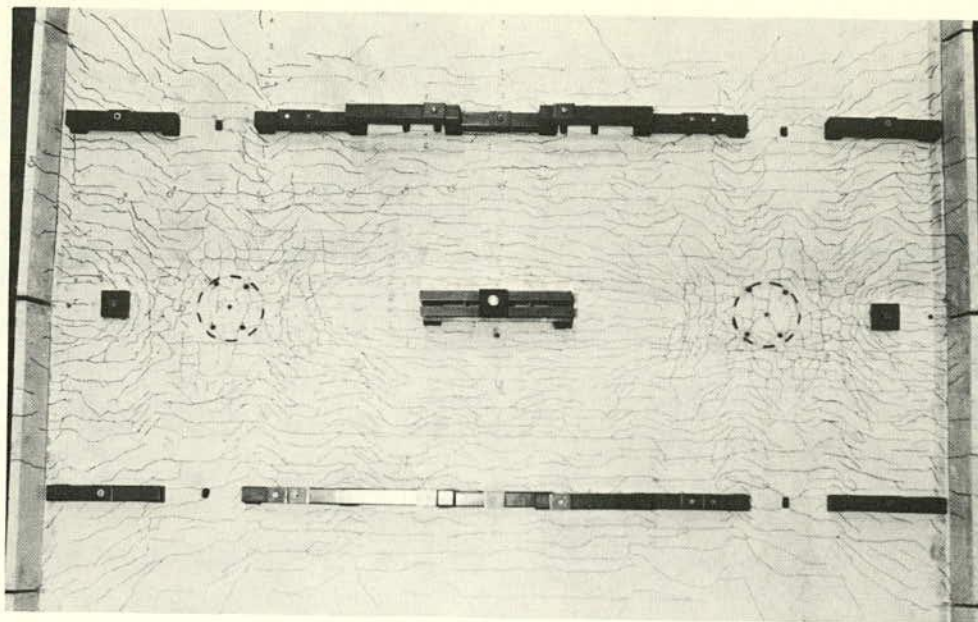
View of Cracking in Roadway Slab of Double-Column Model Bridge
